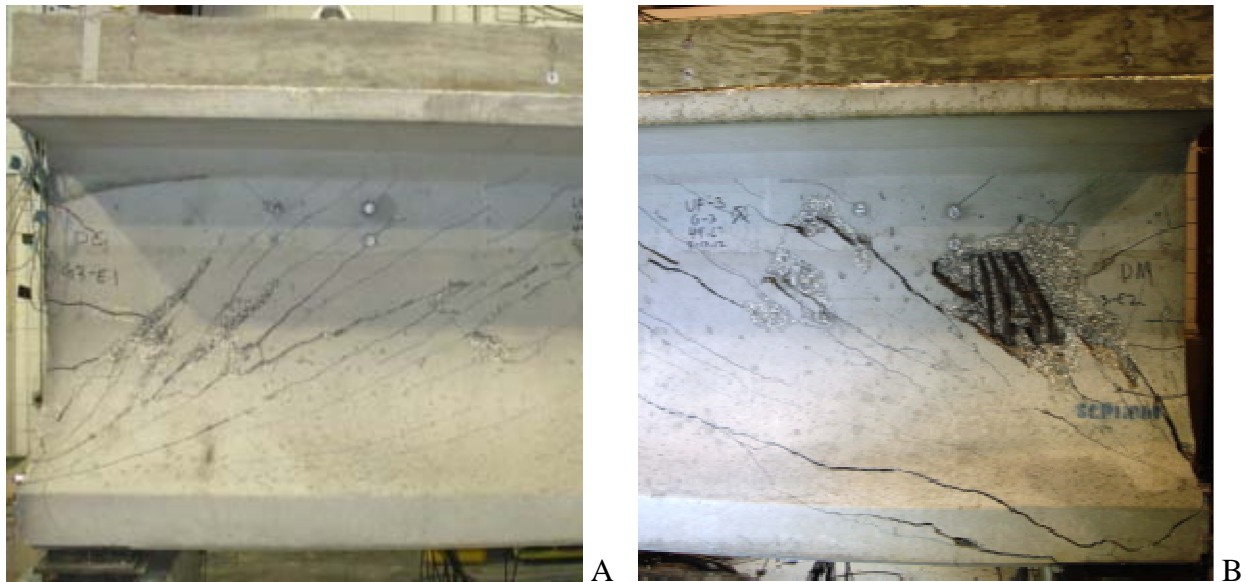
Girder D bottom flange cracking A) specimen DC with limited bottom flange cracking in front of bearing and B) specimen DM with severe bottom flange cracking in front of bearing
